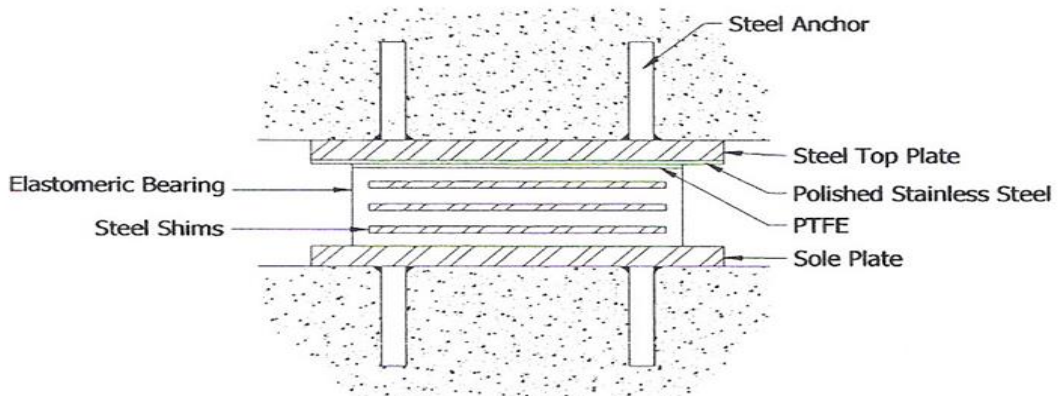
Elastomeric Bearing Shoes (EBS) with PTFE sliding Surface
